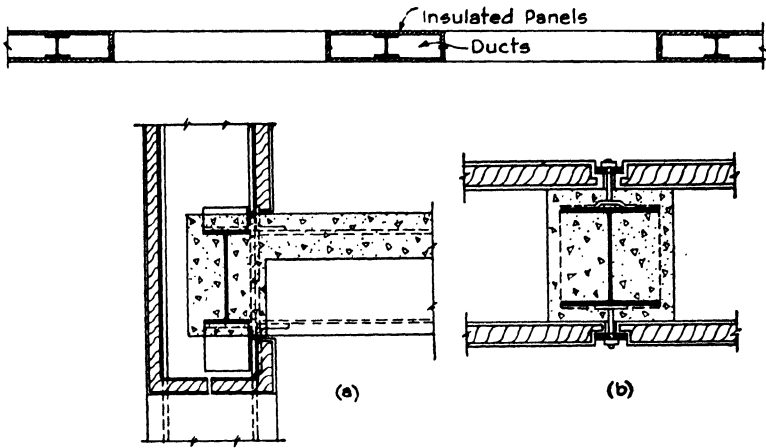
Insulating Metal Wall Panels. (a) spandrel section; (b) column section.
